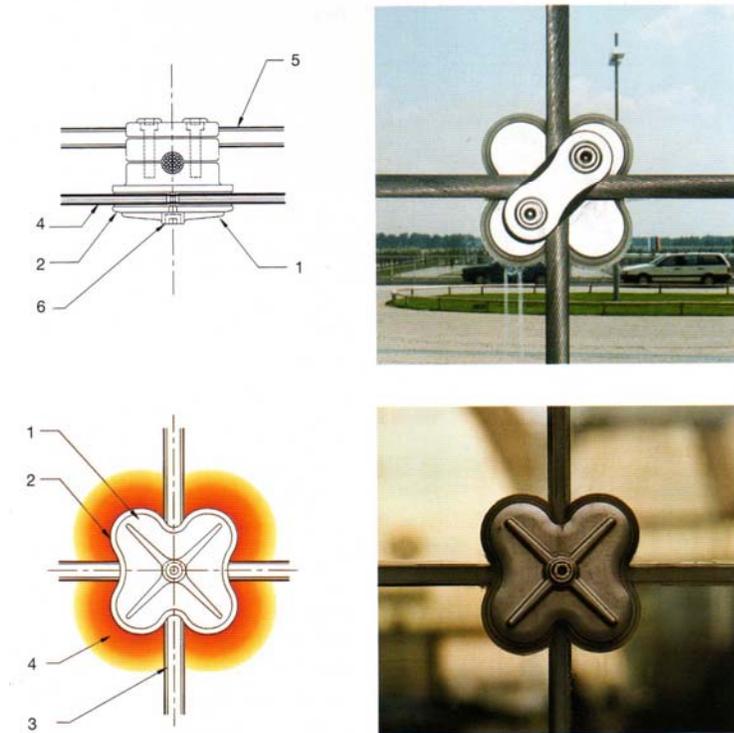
Point-Fixing Glazing Connection (Loughran 20)
